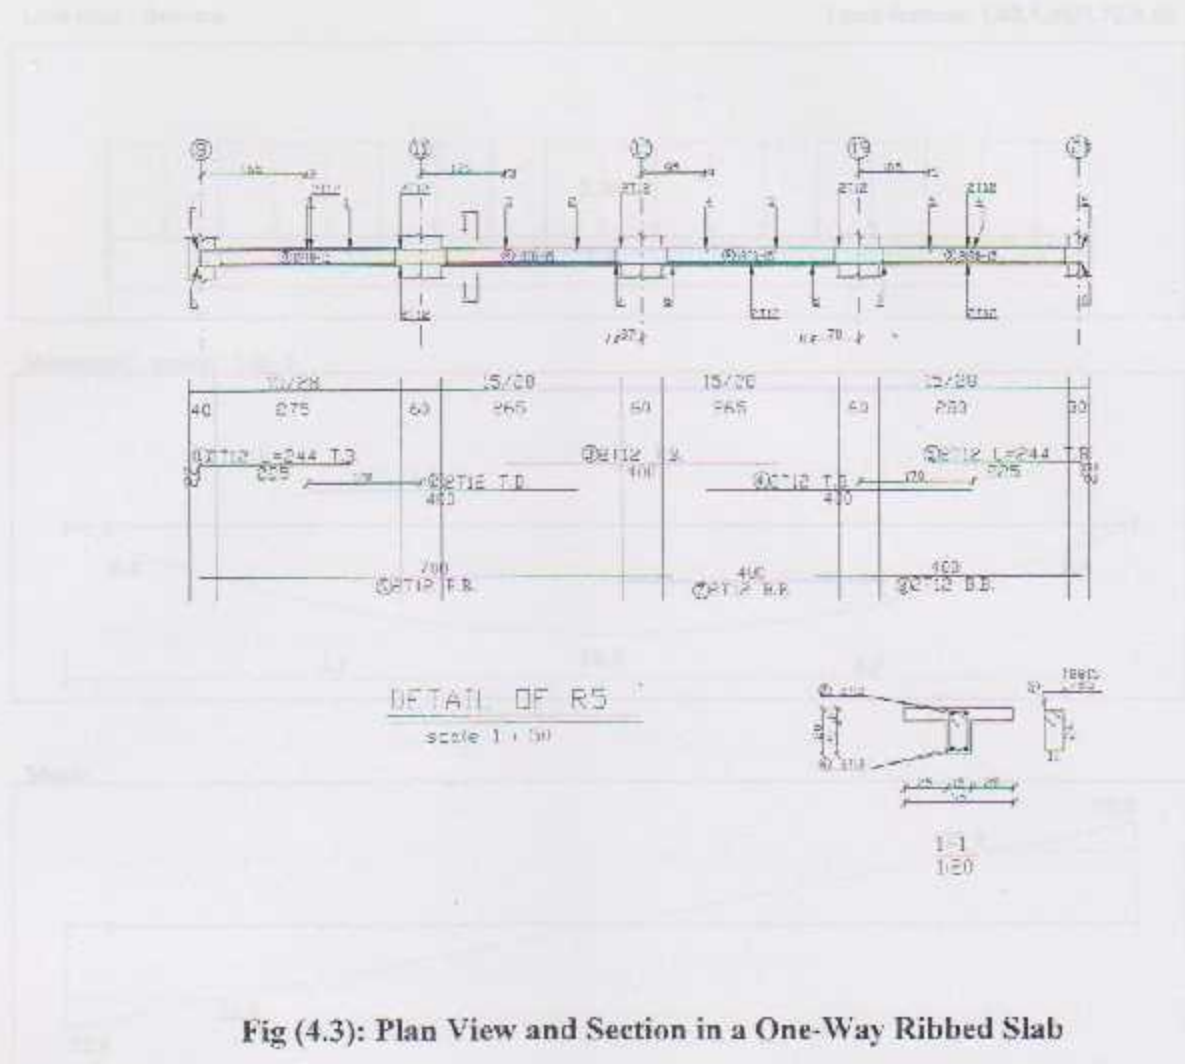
Plan View and Section in a One-Way Ribbed Slab
